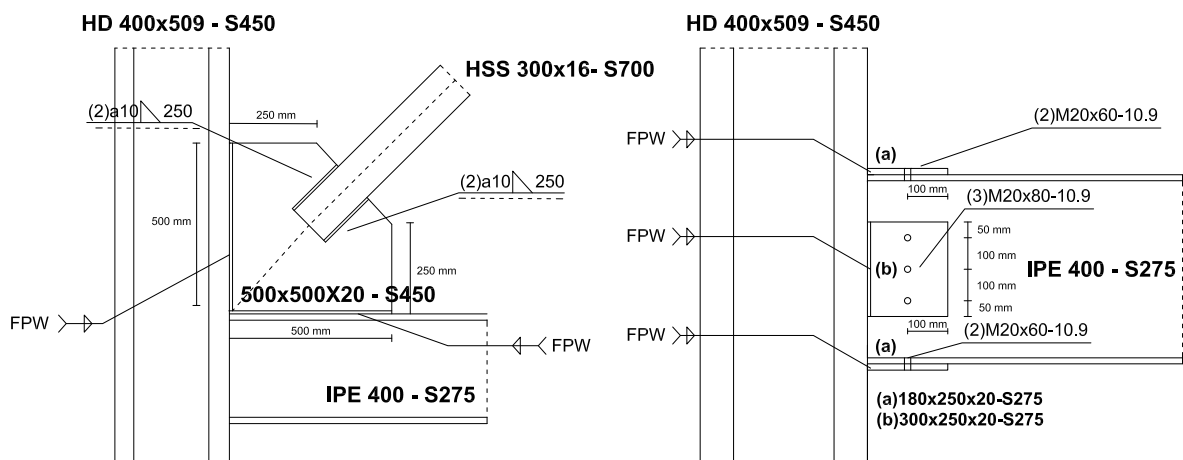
Example of designed gusset-plate (left) and beam-to-column (right) connections.
